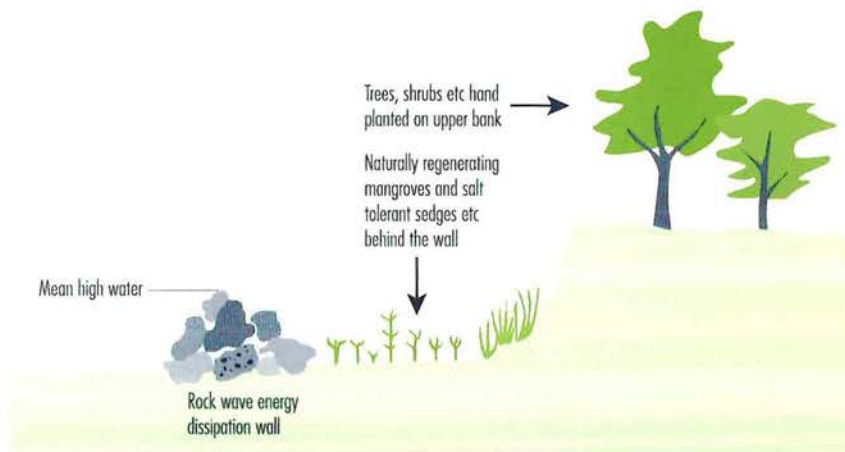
Cross section showing the simplicity of the design. Rock wave energy dissipation walls are constructed parallel to the eroding bank. The distance from the bank depends on the slope and extent of the bench in front of the bank, and the reach of the machine used to place the rock. The wall is built to a height that corresponds with the range between mean high water and mean high water springs. Mangroves and other salt tolerant shrubs and sedges will establish by natural regeneration where a seed source exists. The job is completed by hand planting an upper bank buffer of riparian trees and shrubs.
